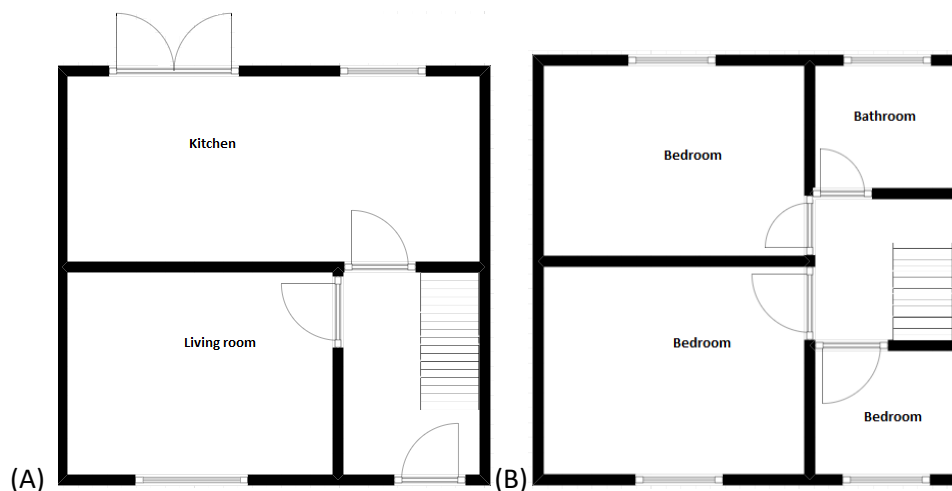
Schematic showing typical layout of the 3 bed roomed semi detached dwellings.
